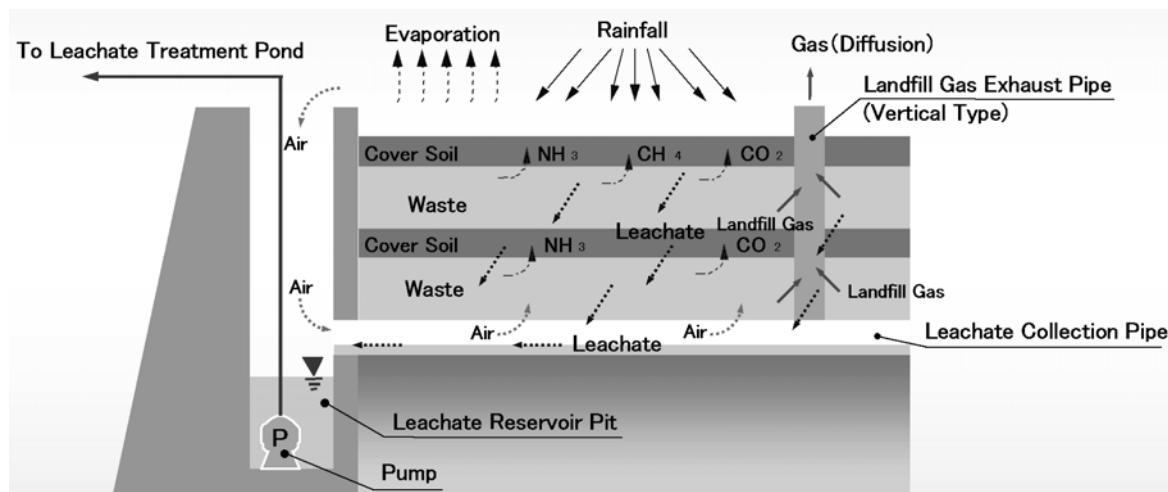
Typical Structure of Sanitary Landfill Site
